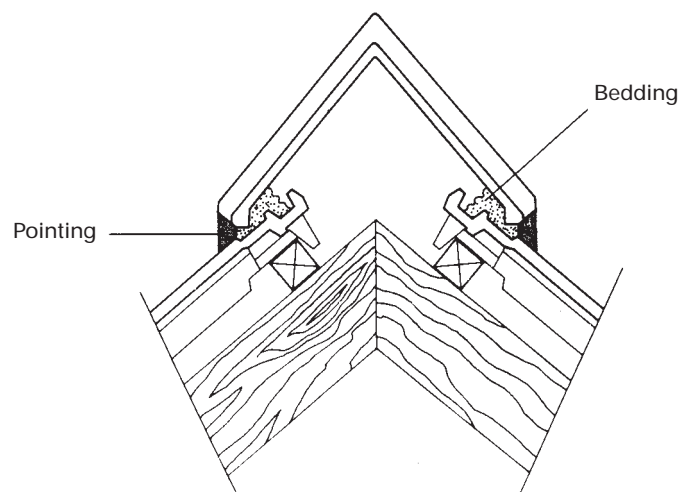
(c) Arched Ridge Typical Detail (Terracotta only)
